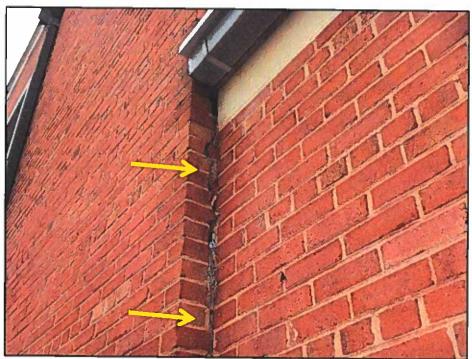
Large crack at Left wall, where the lower wall frames into the taller gymnasium space wall
